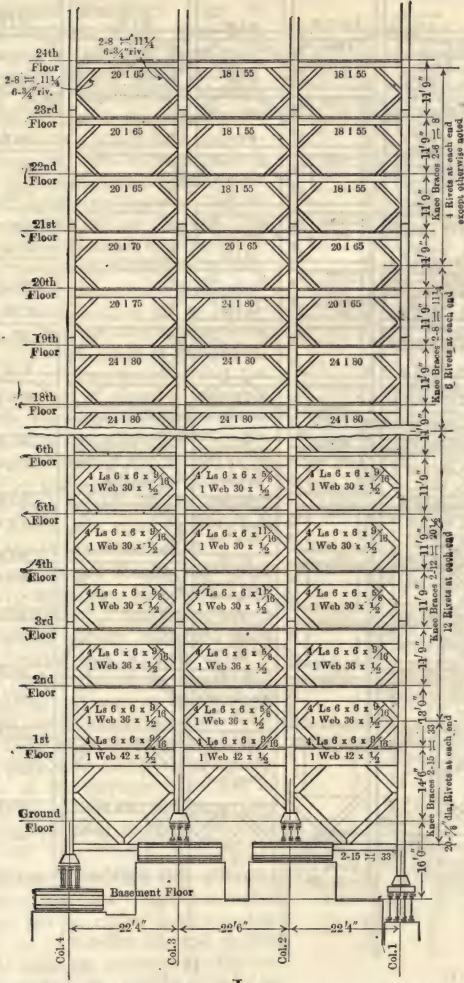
Whitehall Building. Plan and Lines of Bracing
